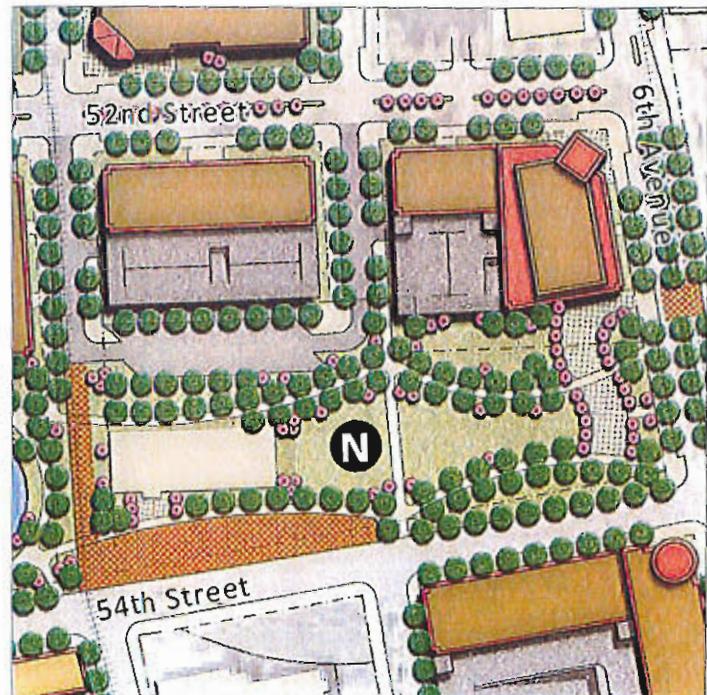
Conceptual Plan Alternative for City Center Open Space
